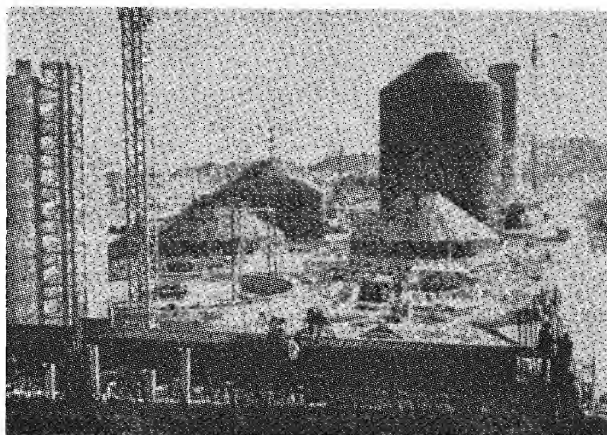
Steel silos for clinker storage; erection by the spiral method (from Peter/Erni, 1978)
